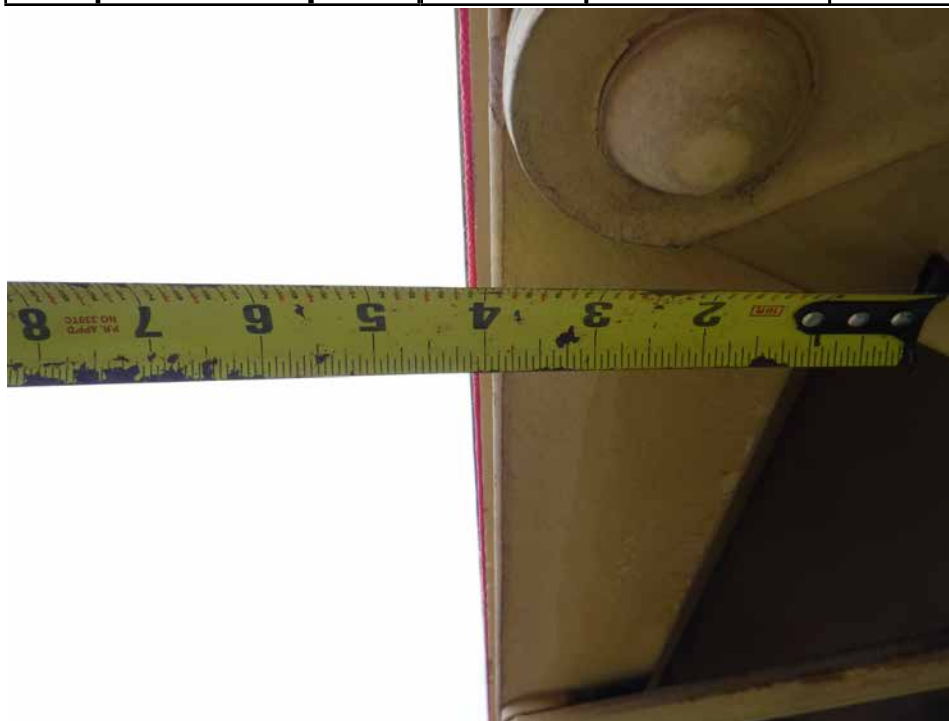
Looking east at pier beam 39 in span 40. Note: Pier beam exhibits significant sweep and has been sistered.
